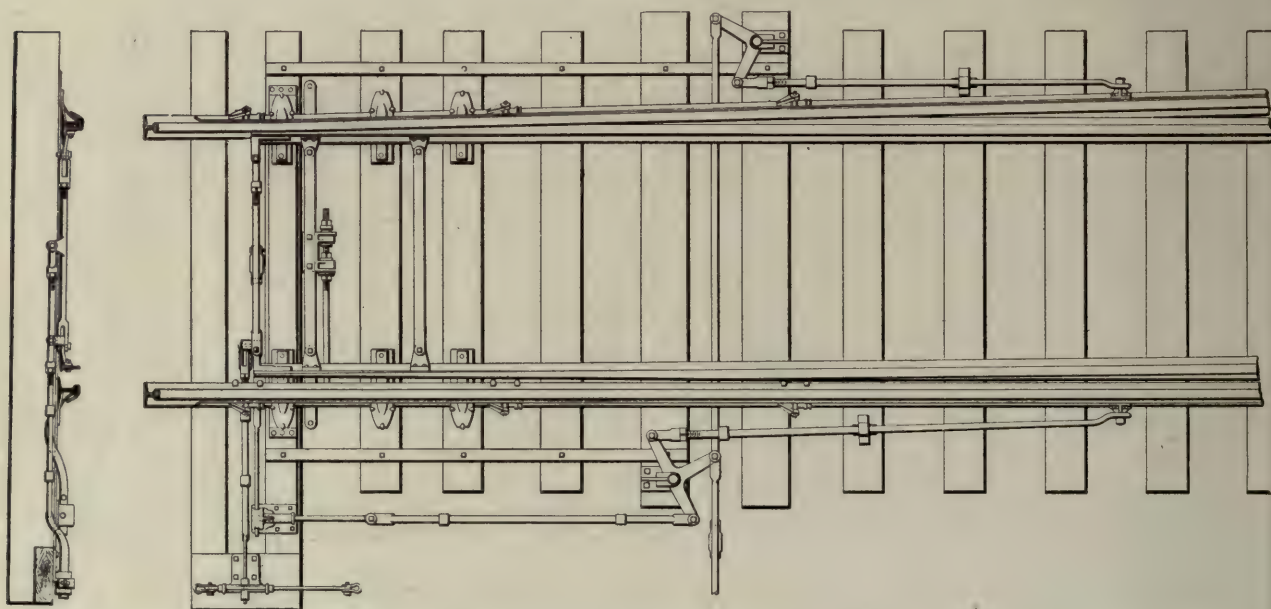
Outside Connected Facing Point Lock and Switch Connections, with Bolt Lock. Two Detector Bars Behind the Points.
